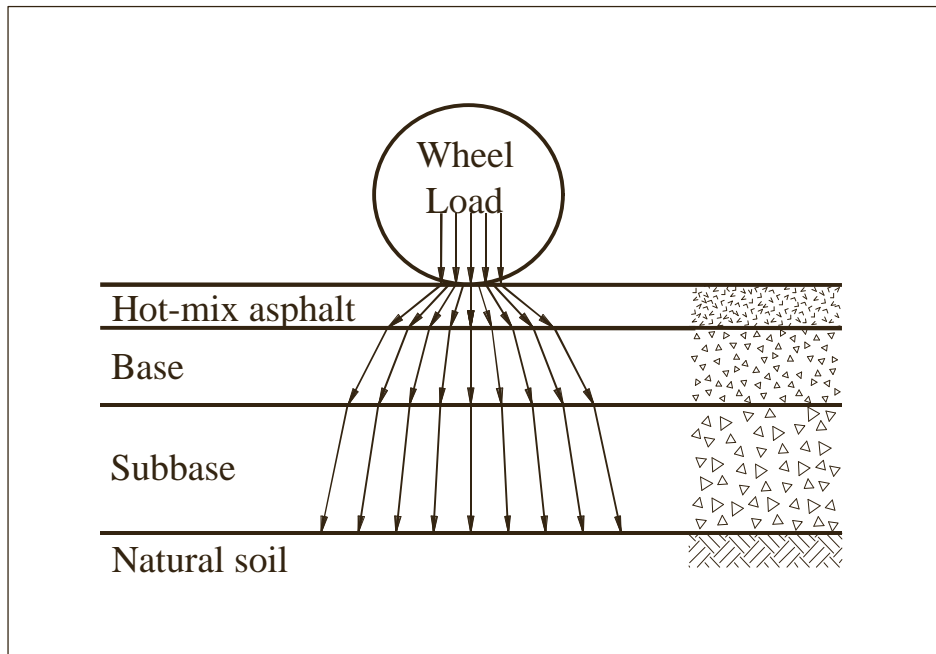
Distribution of wheel load in a flexible pavement.
